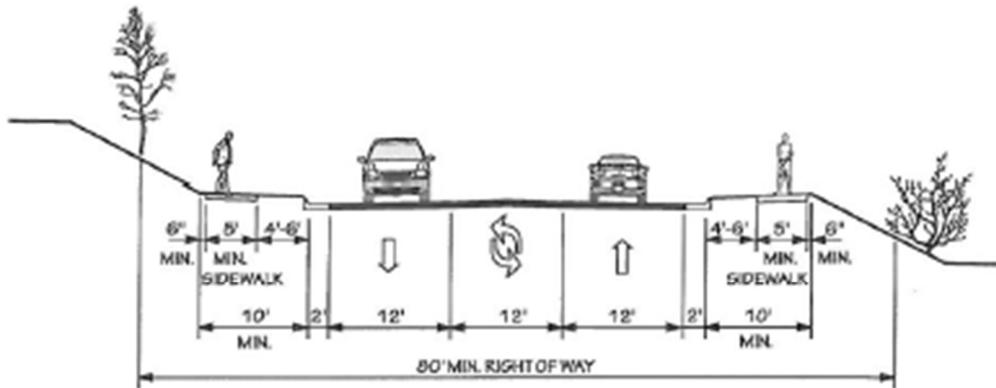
NCDOT typical section of a two-lane divided road with curb and gutter and sidewalks
